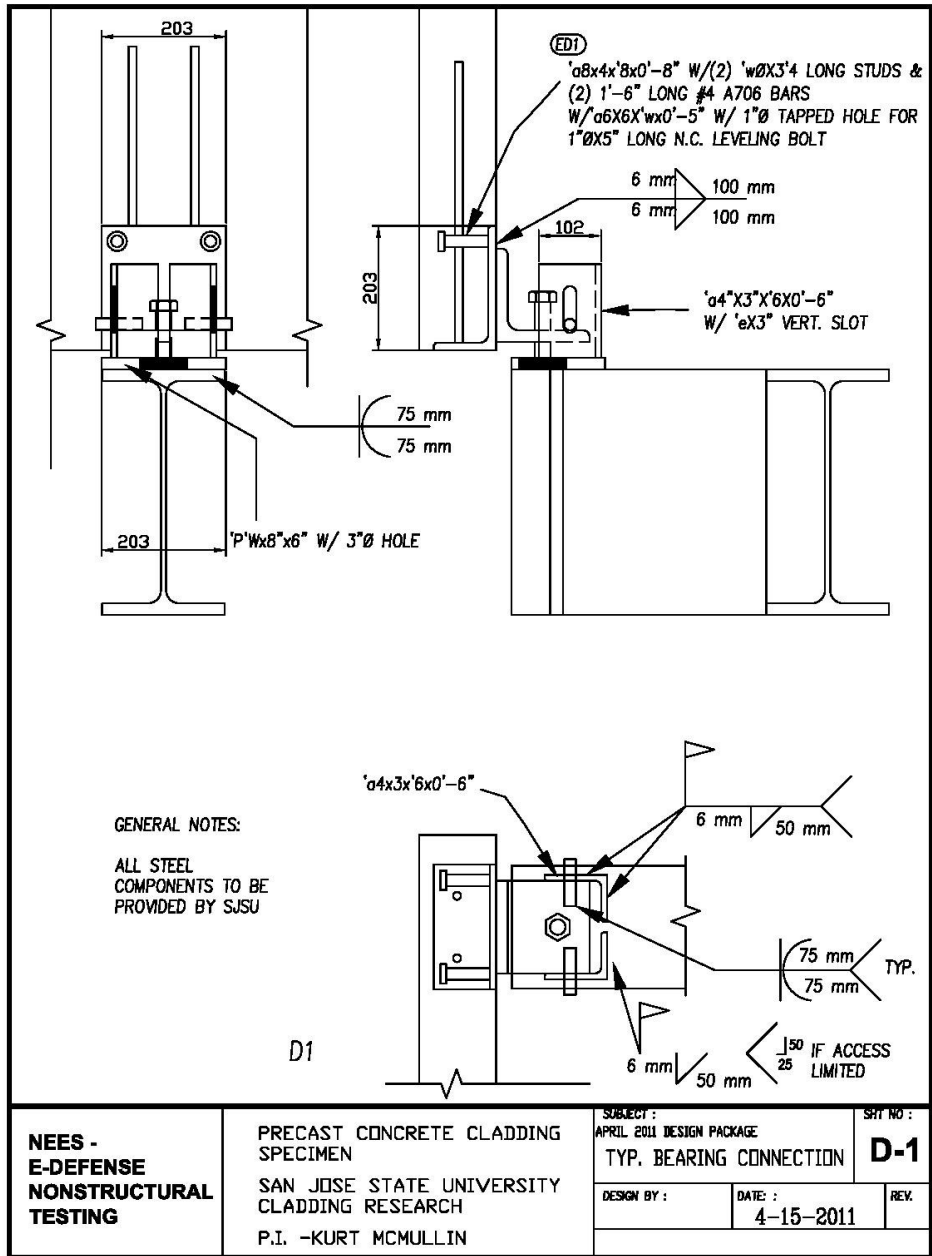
Blueprint Detail of Typical Bearing Connection at Bottom of each Panel
